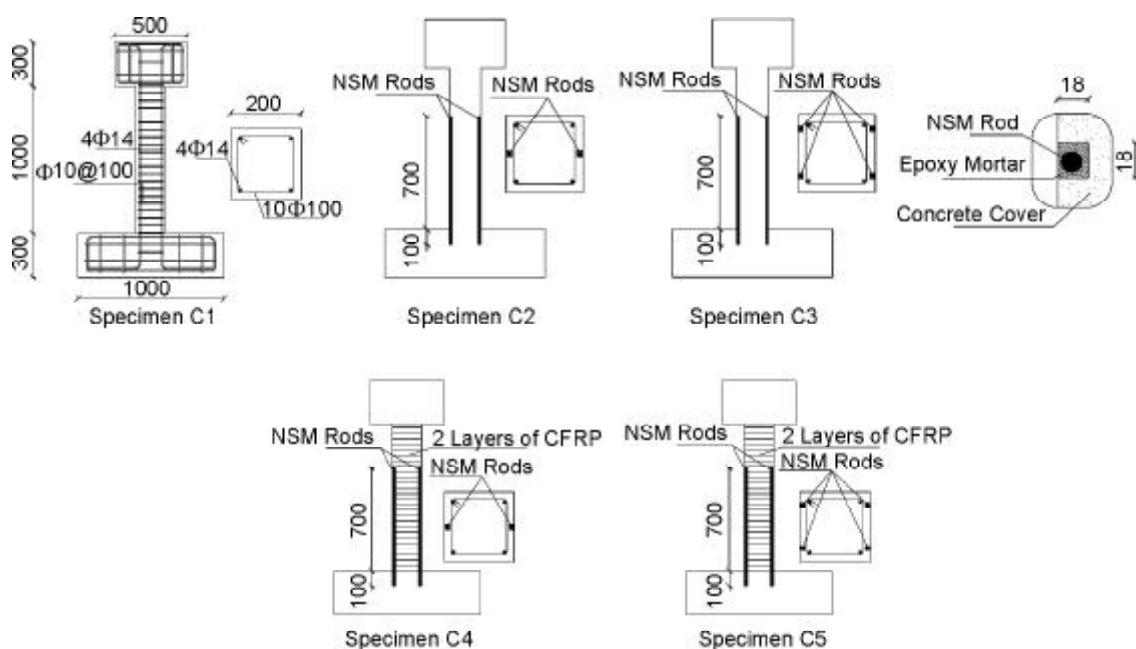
Dimensions, details of reinforcement, and strengthening for the specimens (Unit: mm).
